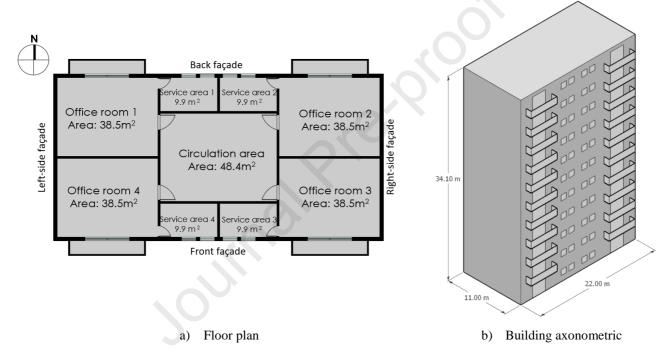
Base case model (a) floor plan (b) building elevation Source: the authors.
